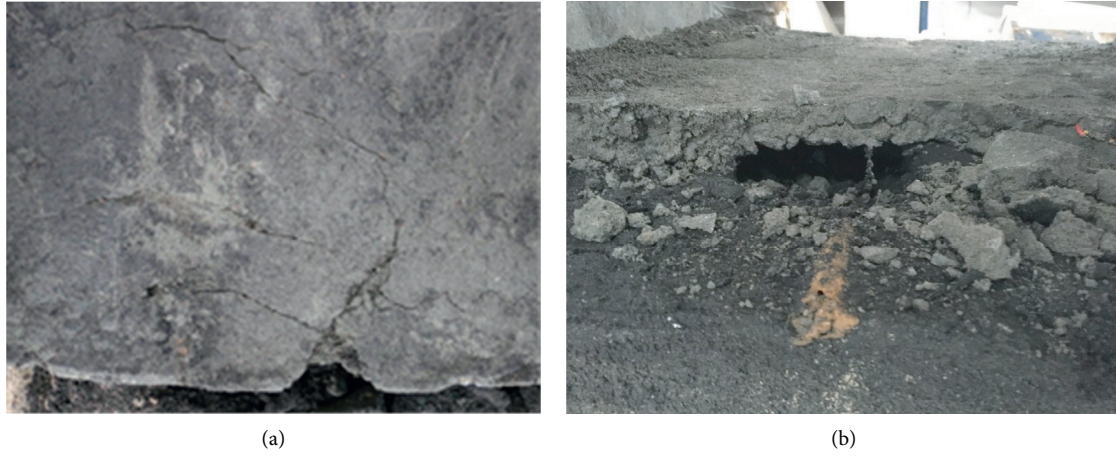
Test 1 cracks after blasting. (a) Test 1 cracks formed after blasting. (b) Test 1 cavity zone formed after blasting.
